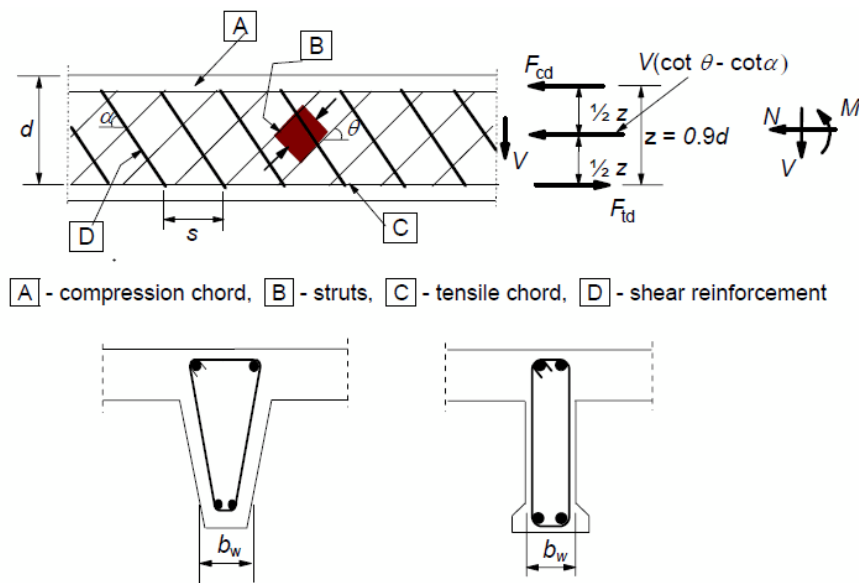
Truss Model and Notation for Shear Reinforced ([EBCS EN 1992], 2014)
